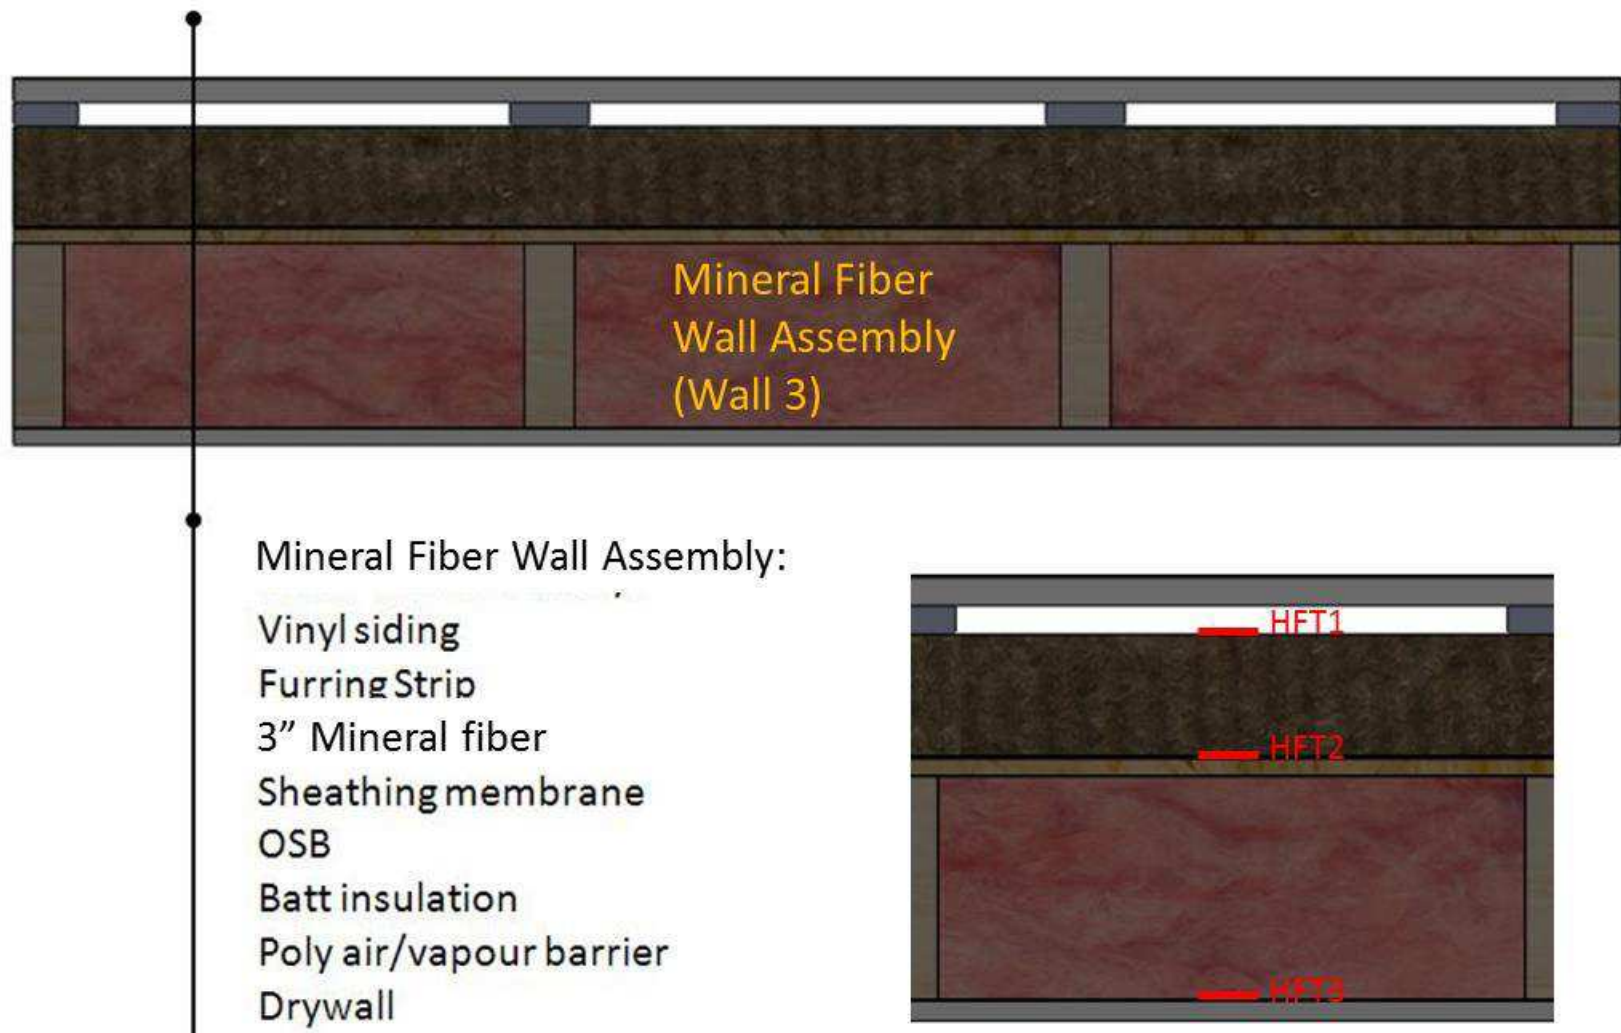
Horizontal cross-section through mineral fibre wall assembly showing locations of Heat Flux Transducers, HFTs (Wall 3)
